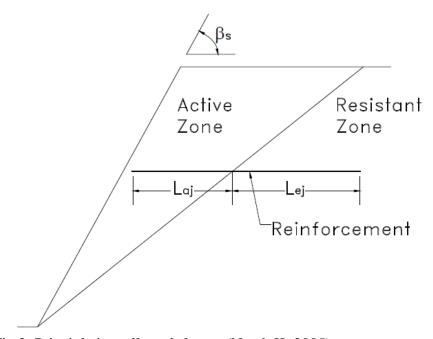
Principle in walls and slopes. (Nand, K. 2005)
